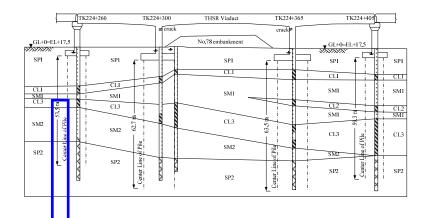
The 3-span viaduct, the cracked piers, and the pile foundations
